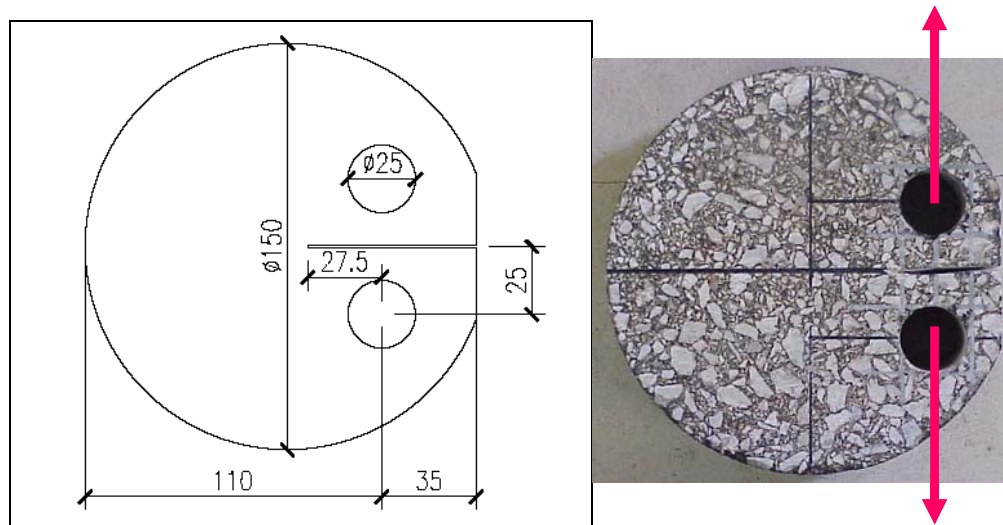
Specimen dimensions of the DC(T) sample (mm) and DC(T) loading setup
